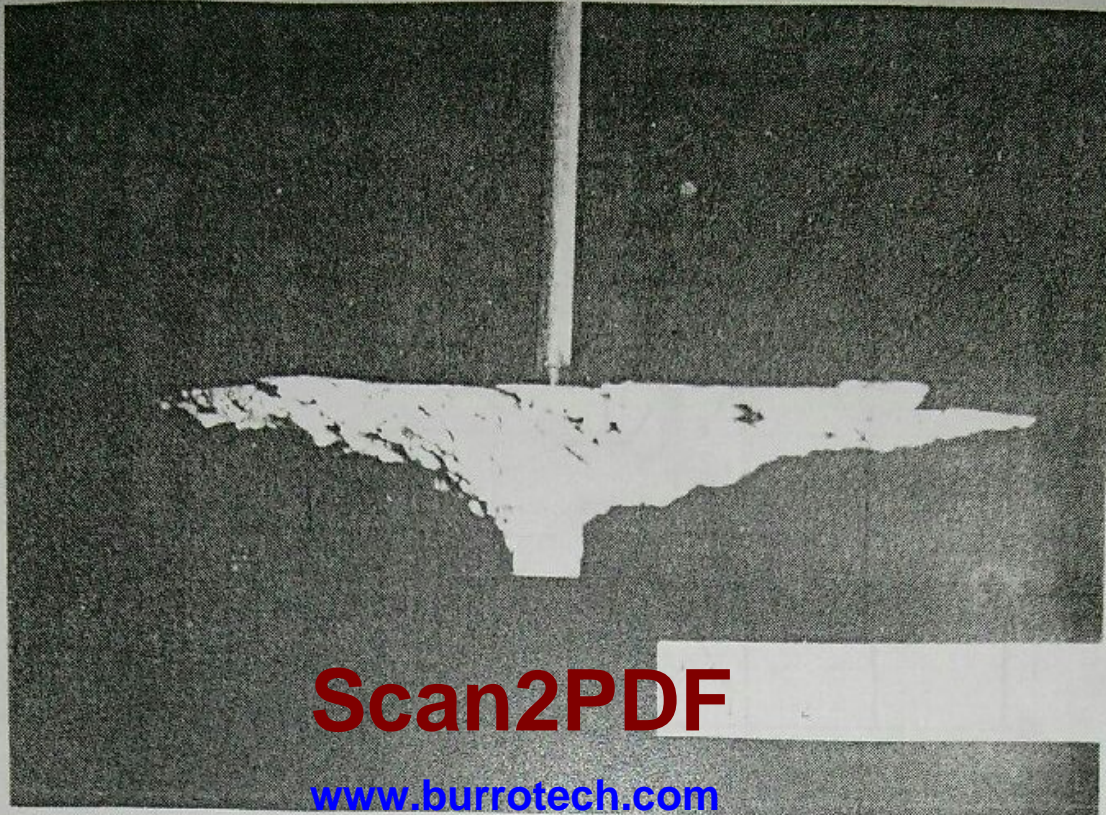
Truncated Failure Cone of Concrete around a RAMSET TCM-12 Concrete Insert.
